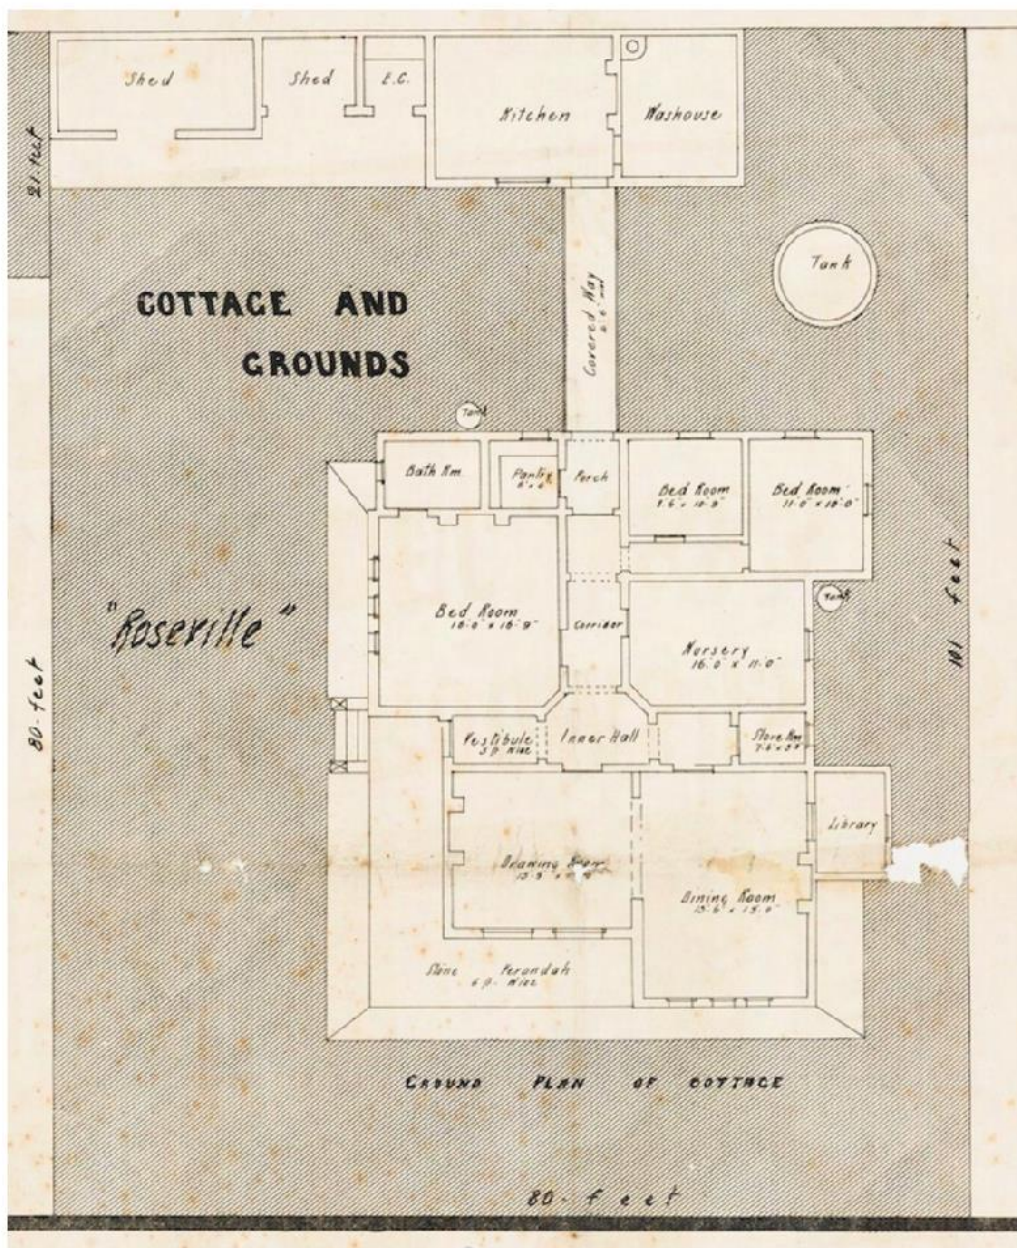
Plan of "Roseville" from the December 1883 auction notice. The plan indicates the location of the above-ground and underground water supply tanks as well as the configuration of the outbuilding with the Earth Closet. The underground tank may remain in-situ under the ground. The only part of the outbuilding still remaining is the section containing the spaces for the Kitchen and Wash House.
